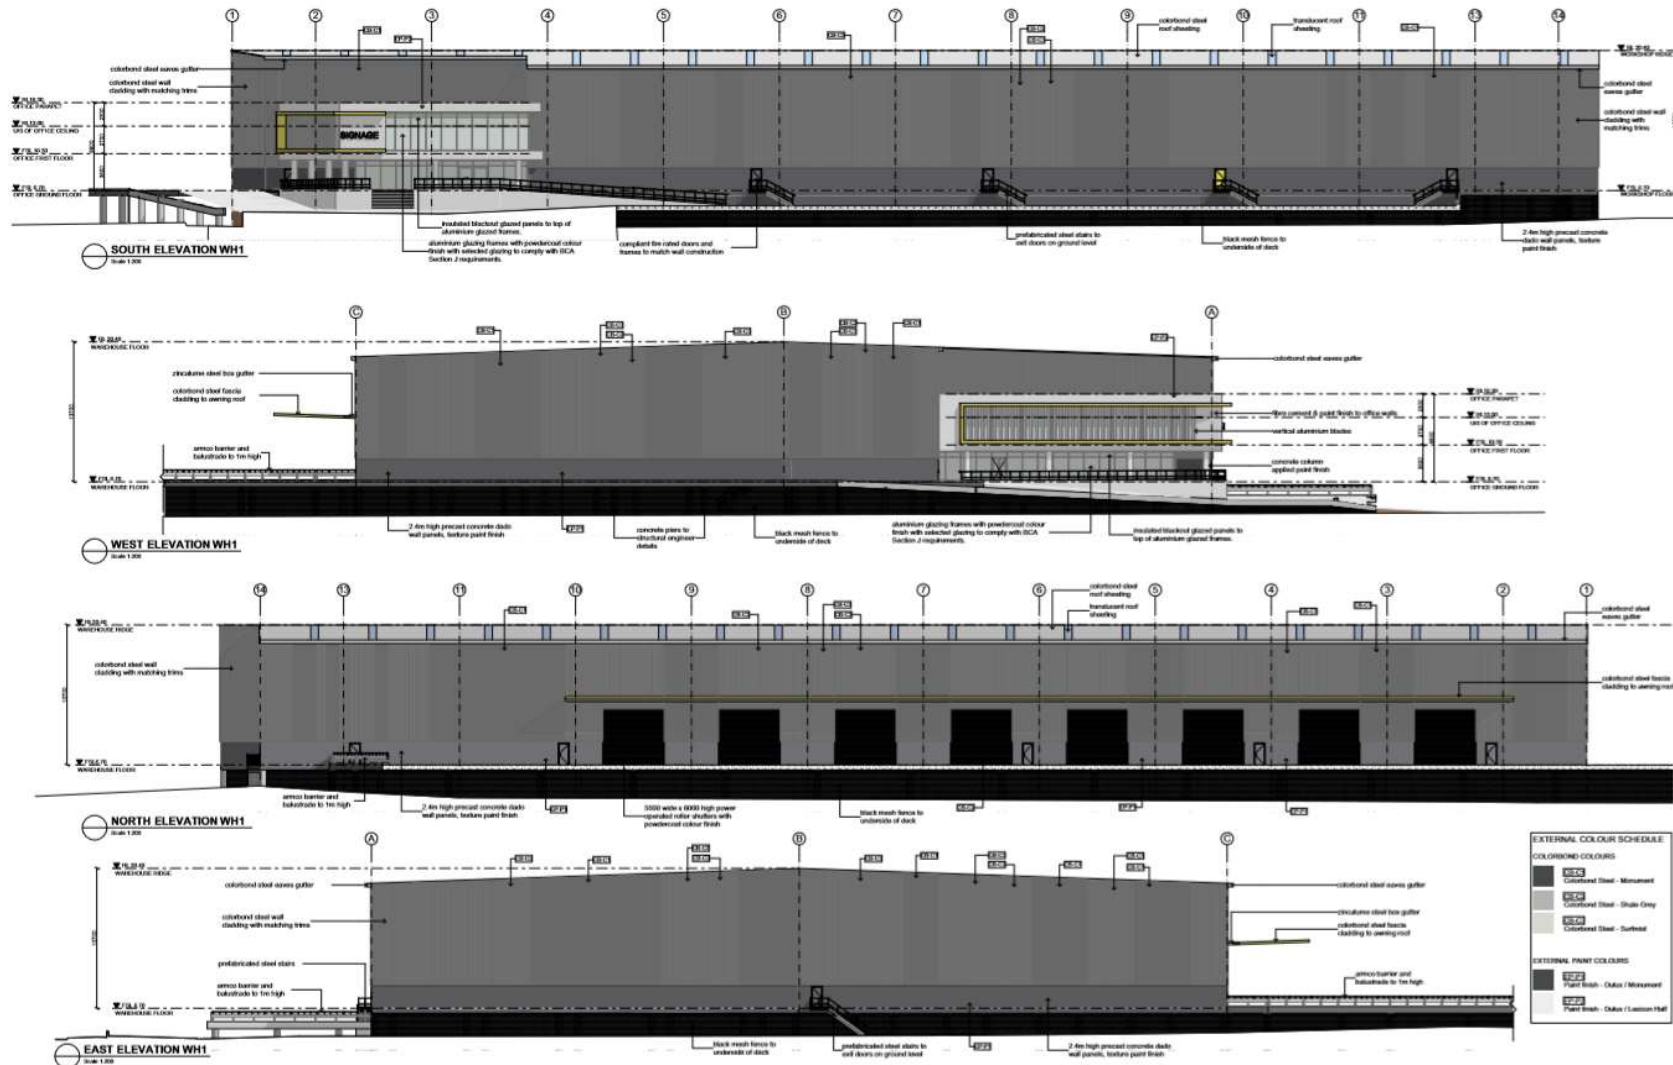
Building elevations – Warehouse 1 (Source: Axis Architectural)
